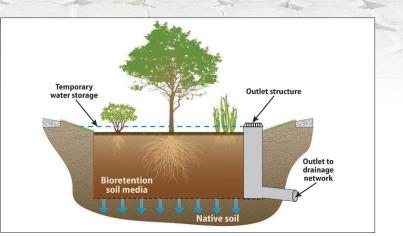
Overflow drain. Stormwater fills the practice and begins soaking through the bioretention soil media and into native soil. Excess water can spill through an outlet structure to an alternative drainage network.
